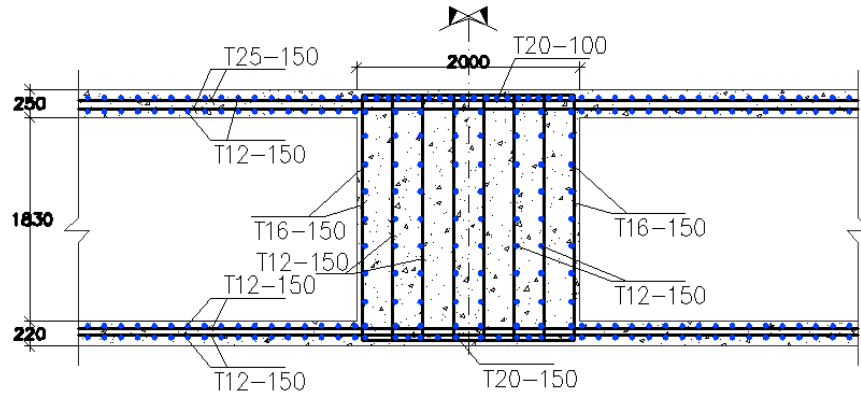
RC Bridge. Reinforcement details of the middle diaphragm.
